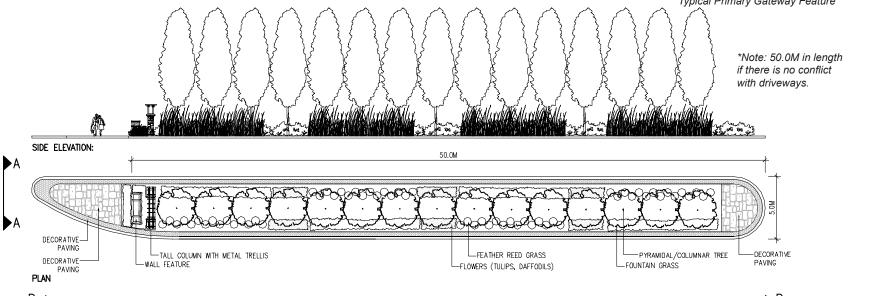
Concept Plan and Side Elevation B-B - Typical Primary Gateway Feature
